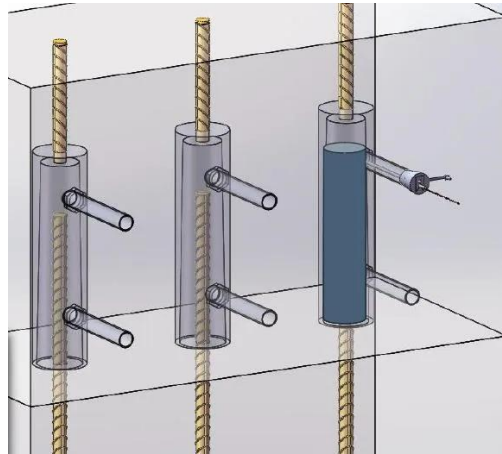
Schematic diagram of grouted sleeve connection shear wall
